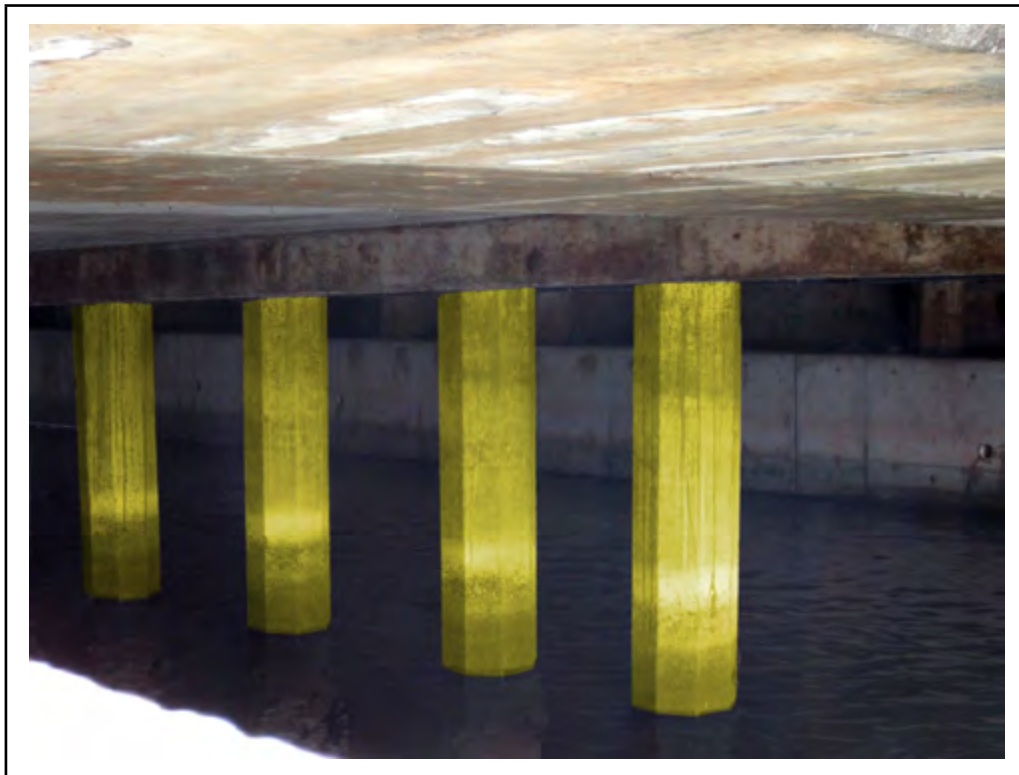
Prestressed Concrete Pile (Highlighted)
